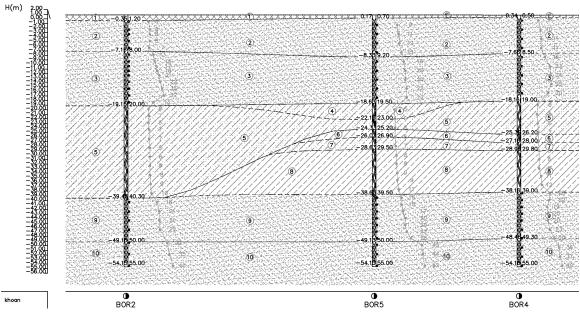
Longitudinal Section of Soil Survey at STP Site
